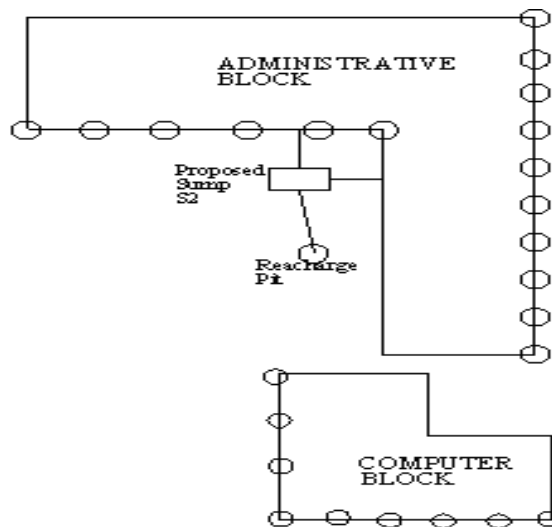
Schematic Plumbing Layout of Collection System for Sump S2
